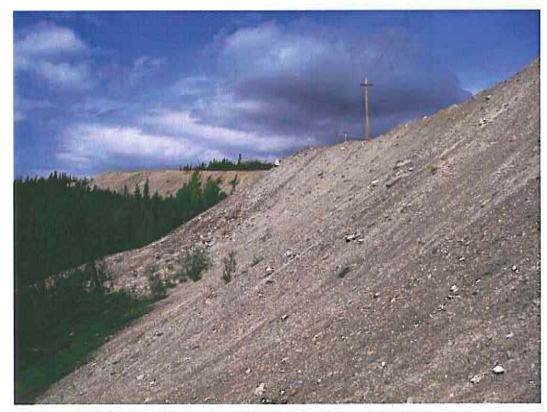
WNW view, of bank adjacent to main haul access road. Note the large volume of waste rock/road fill material which has been placed.
